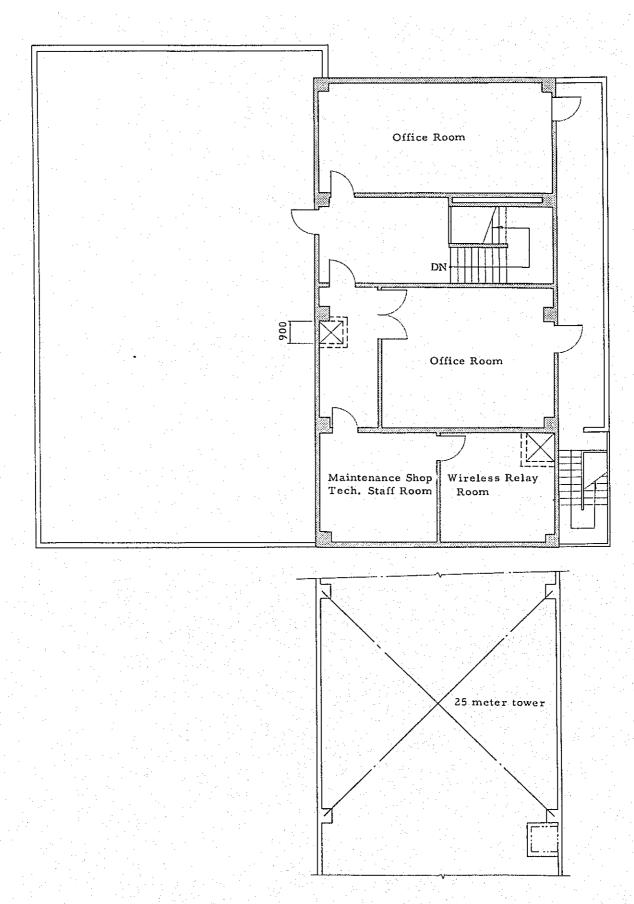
Lay out PI AN of New Radio Studio Building - 4F & Roof PLAN
